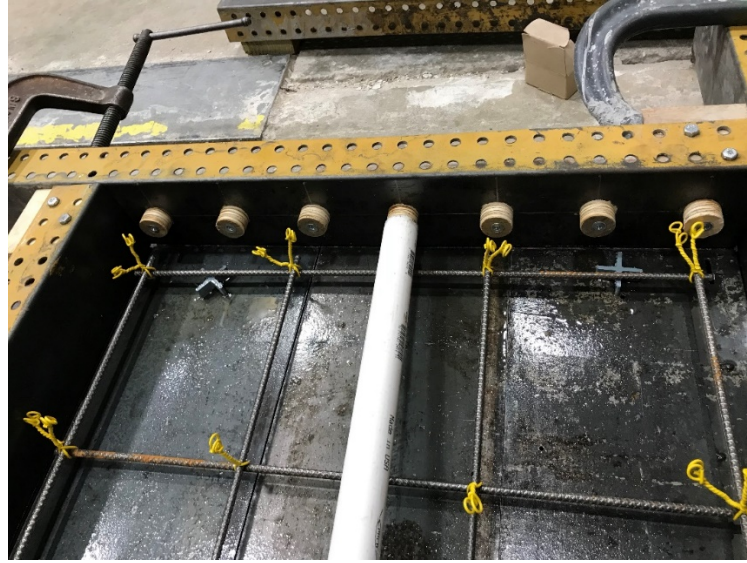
Plywood Blocks Impaled to the Steel Plates to Support PVC Pipes
